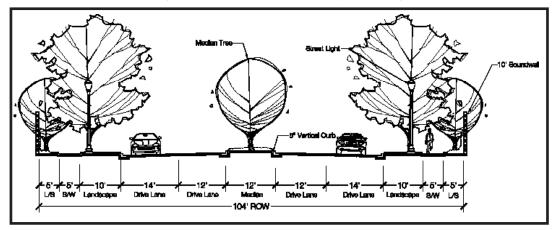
Arterial Road - Union Road North of Community Entry, Section F
